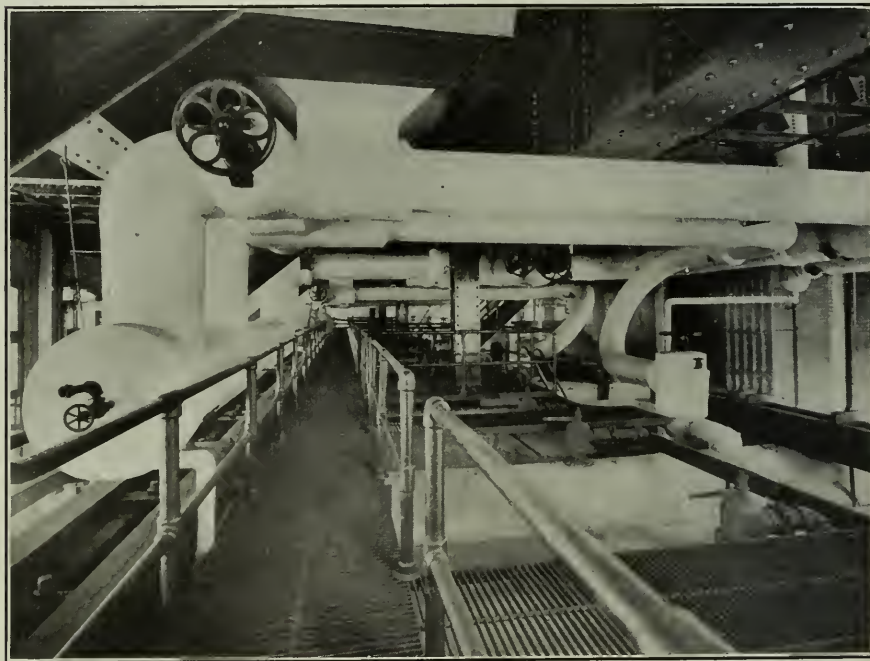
PIPING AND WALKWAYS ABOVE THE BOILERS
